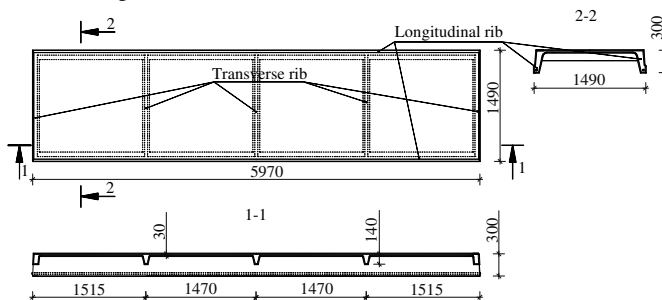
Top view, longitudinal and transversal section of a precast ribbed panel
